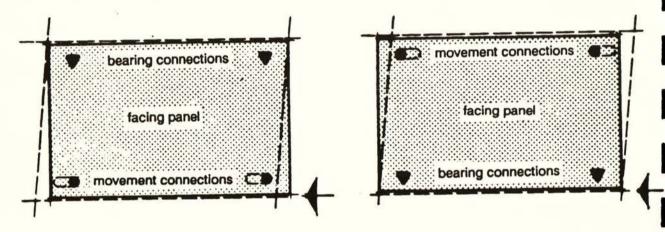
Top and bottom bearing connections for fixing facing panels.
